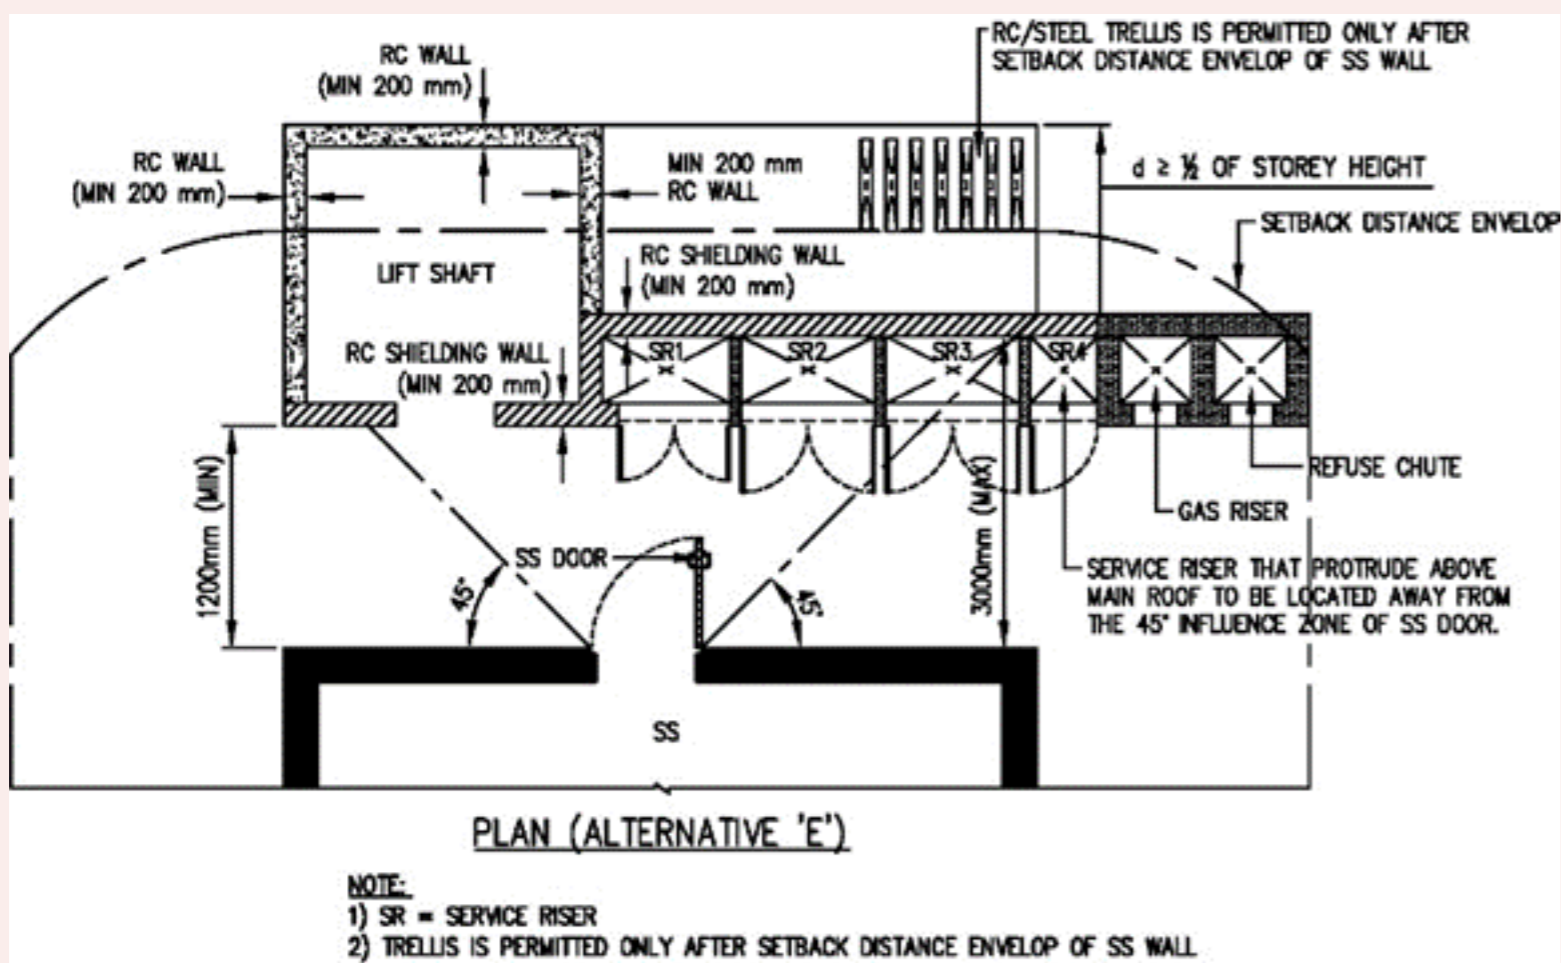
(c): SHIELDING FOR SS DOOR
